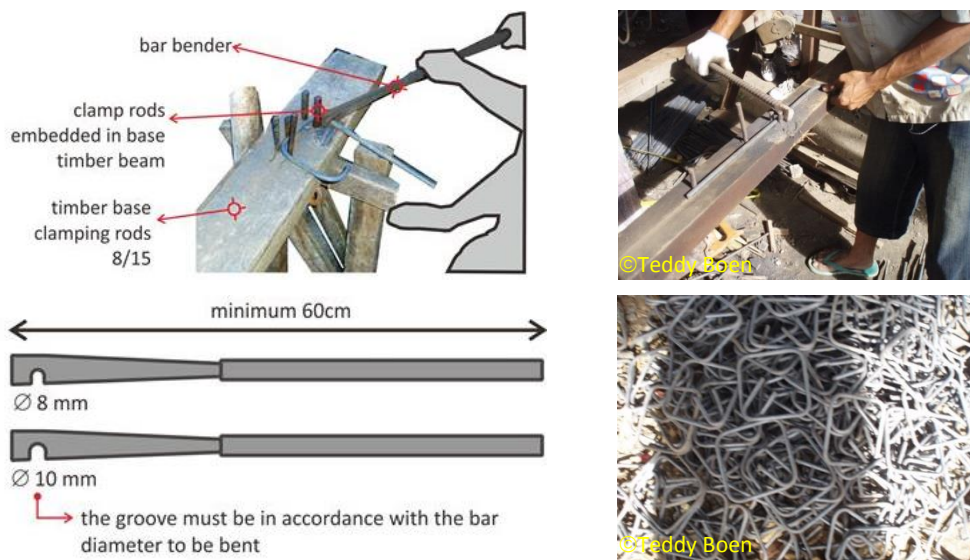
Preparation of Beam and Column Reinforcing Bars
